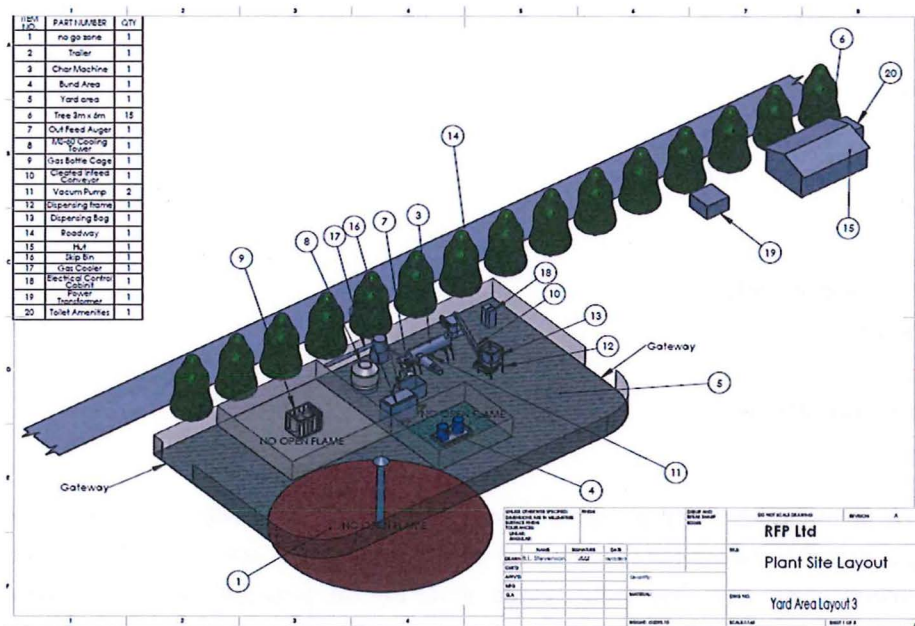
Prototype plant site layout (sourced from CPT, 2012)
